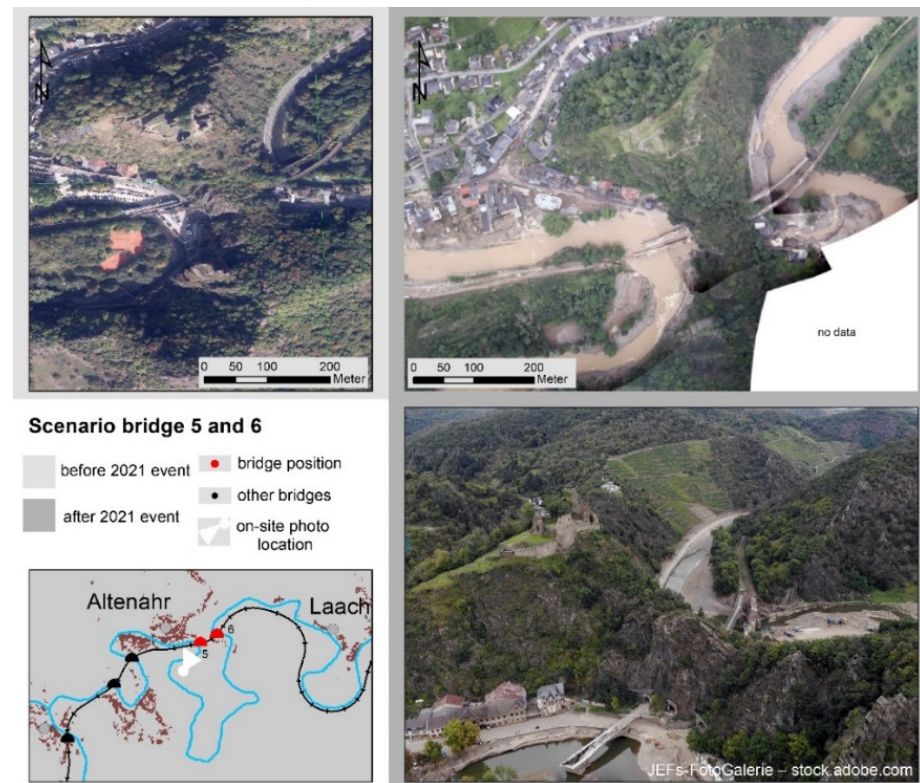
Aerial views before (left, [40]) and after (right, [37]) the event and a photograph illustrating the special situation at bridges 5 and 6 where the drainage situation was partially reversed due to the lower road tunnel.
